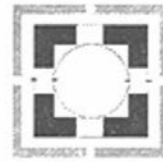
Qasr-i-Shirin, detail – fire temple plan
